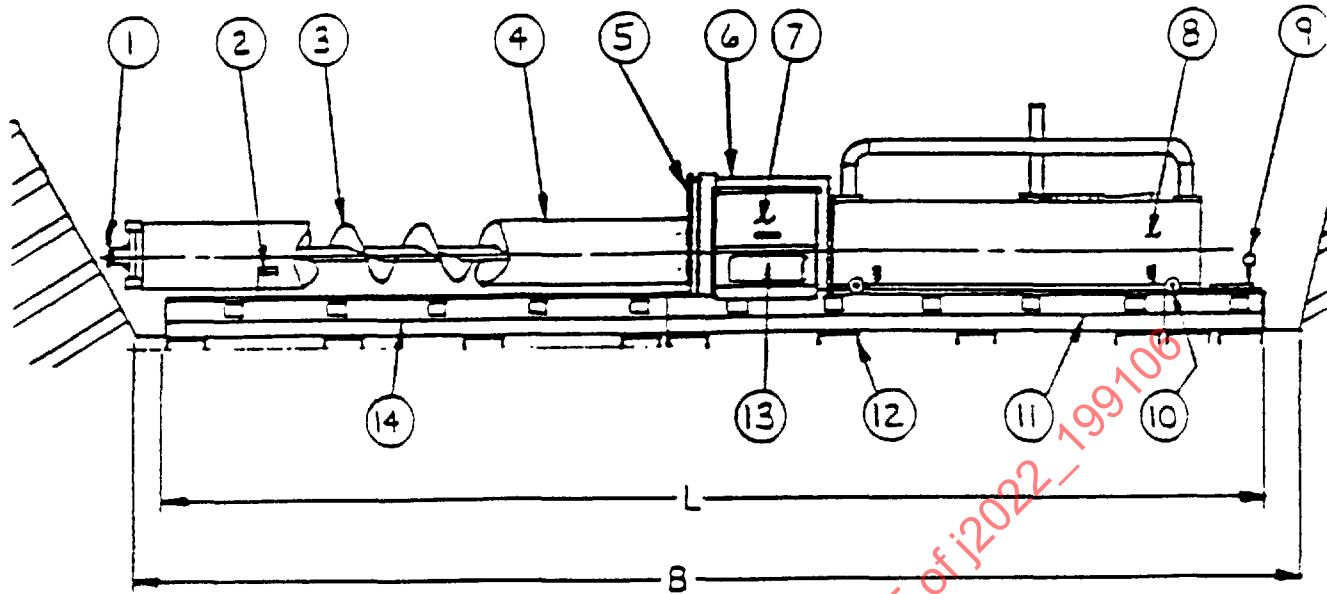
TRACK-TYPE AUGER BORING MACHINE
